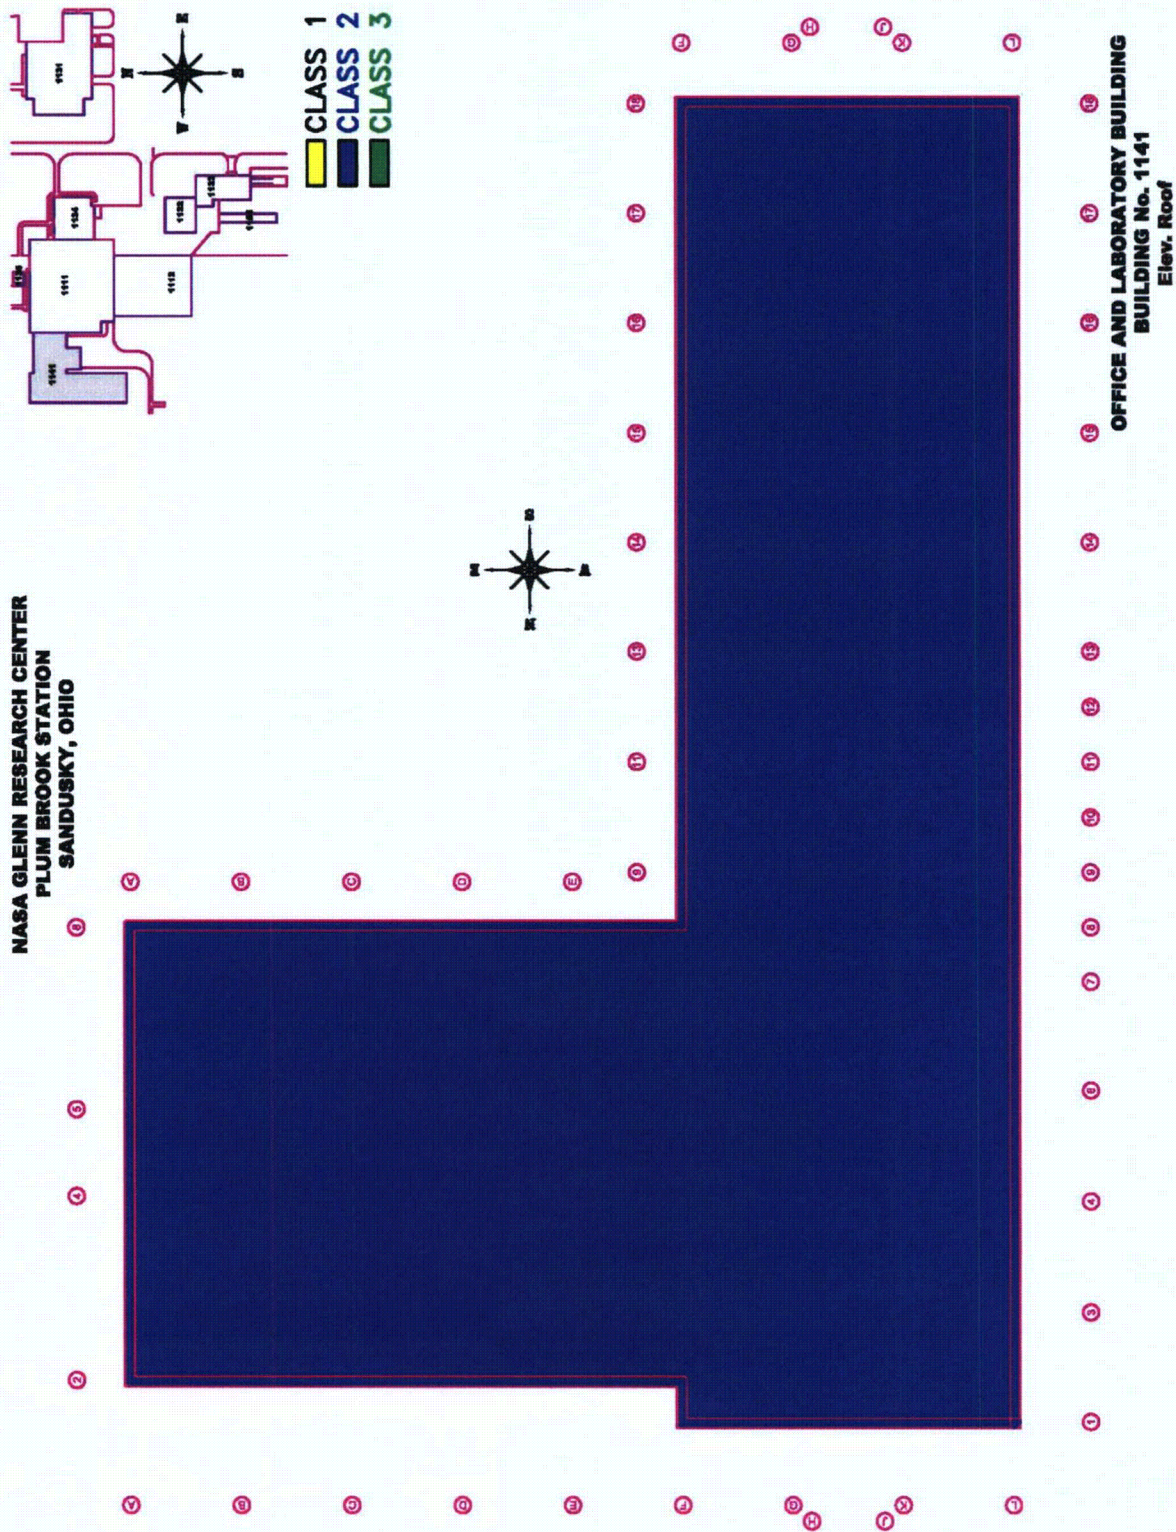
Reactor Office and Laboratory Building Roof Elevation
